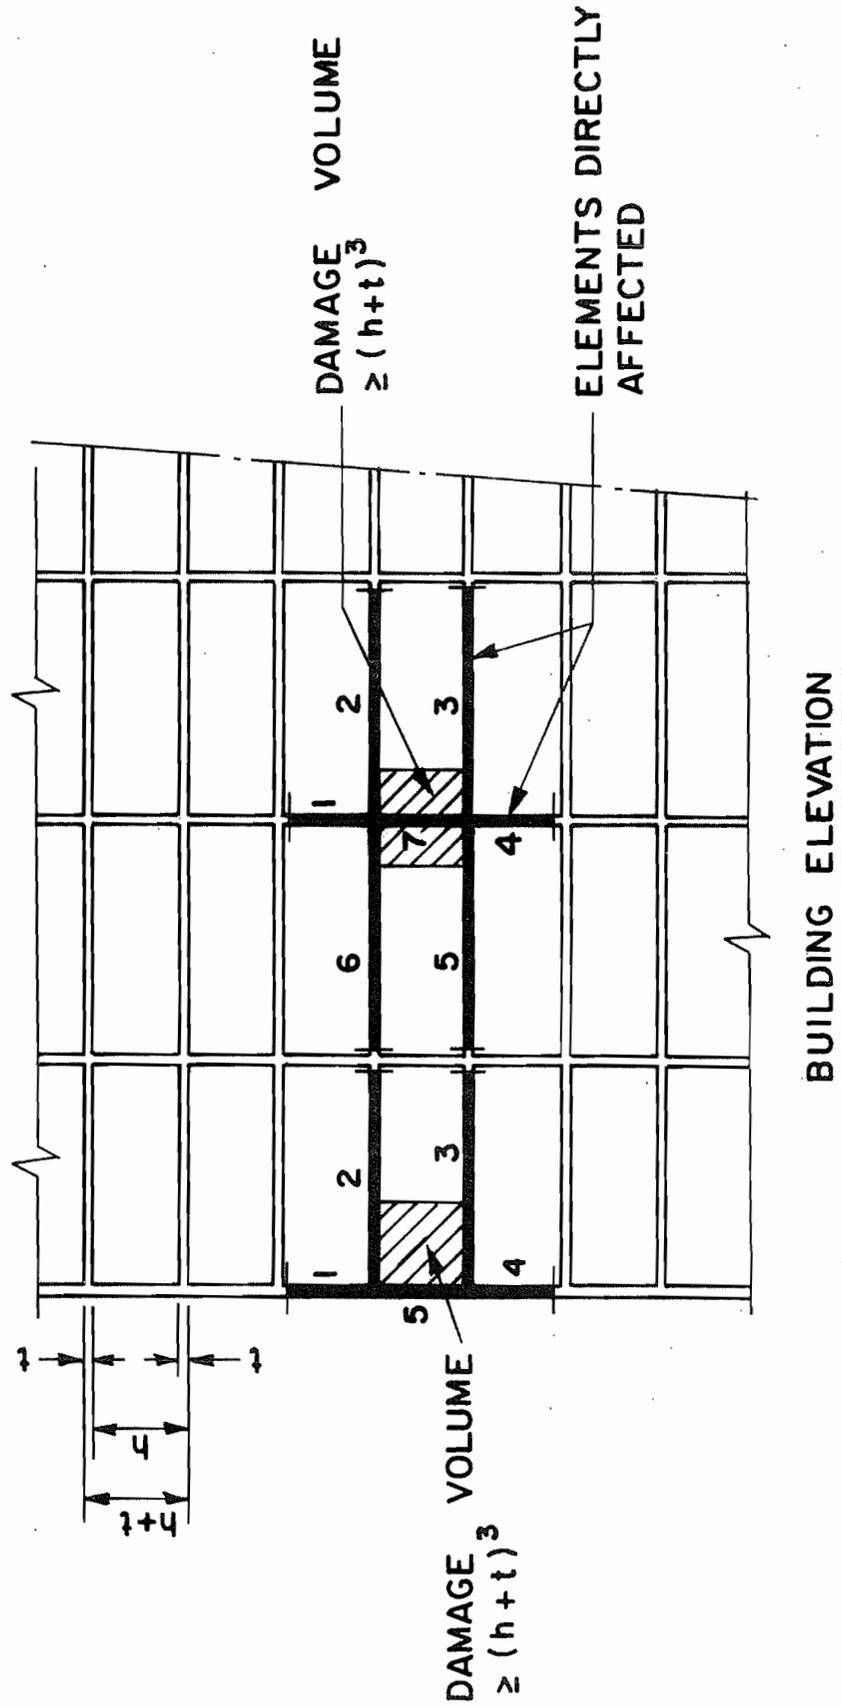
EXAMPLES OF DAMAGE VOLUMES IN A BUILDING WITH TRANSVERSE LOAD BEARING WALLS
